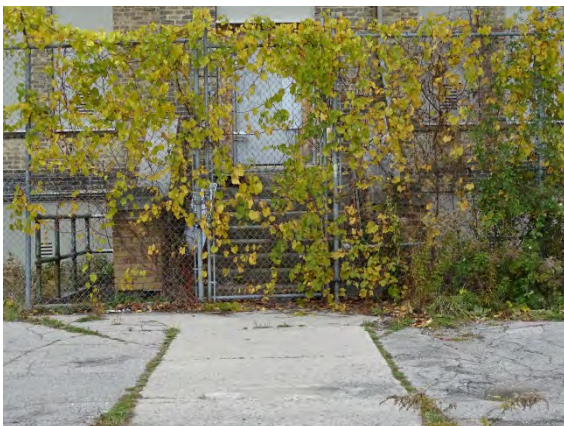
Central Administration Block – Entrance – South Elevation (Photo No. 108.0)
